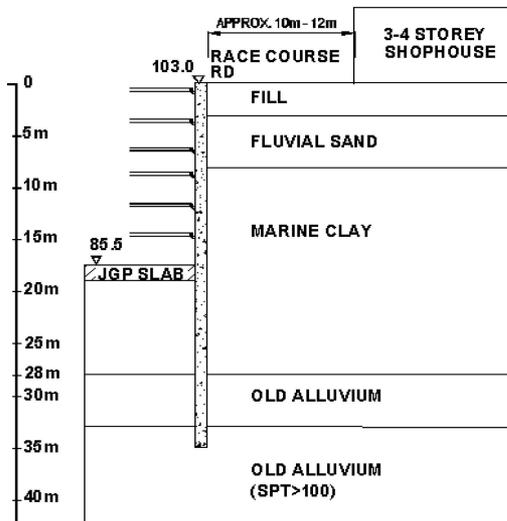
Jet grout slab used as a buried strut, cut-and-cover tunnels along Race Course Road.
